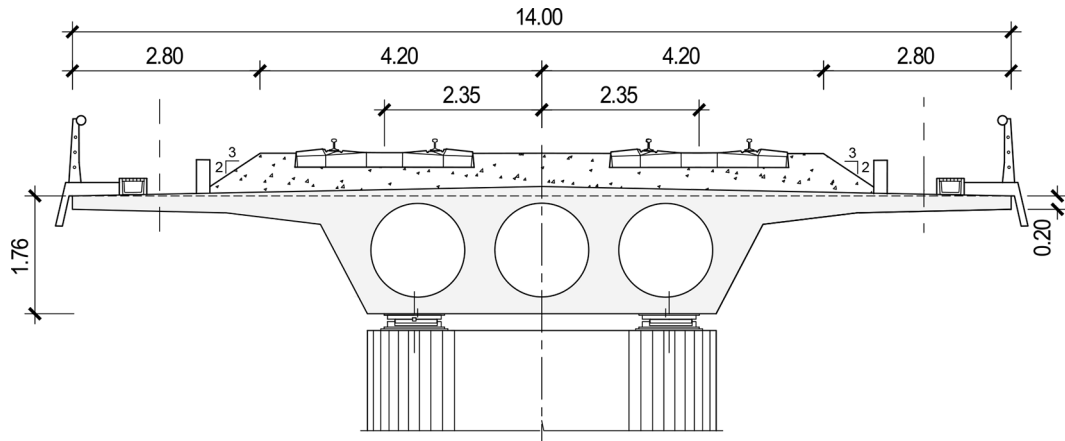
Typical cross-section of a hollow-slab bridge, adapted from [8]
